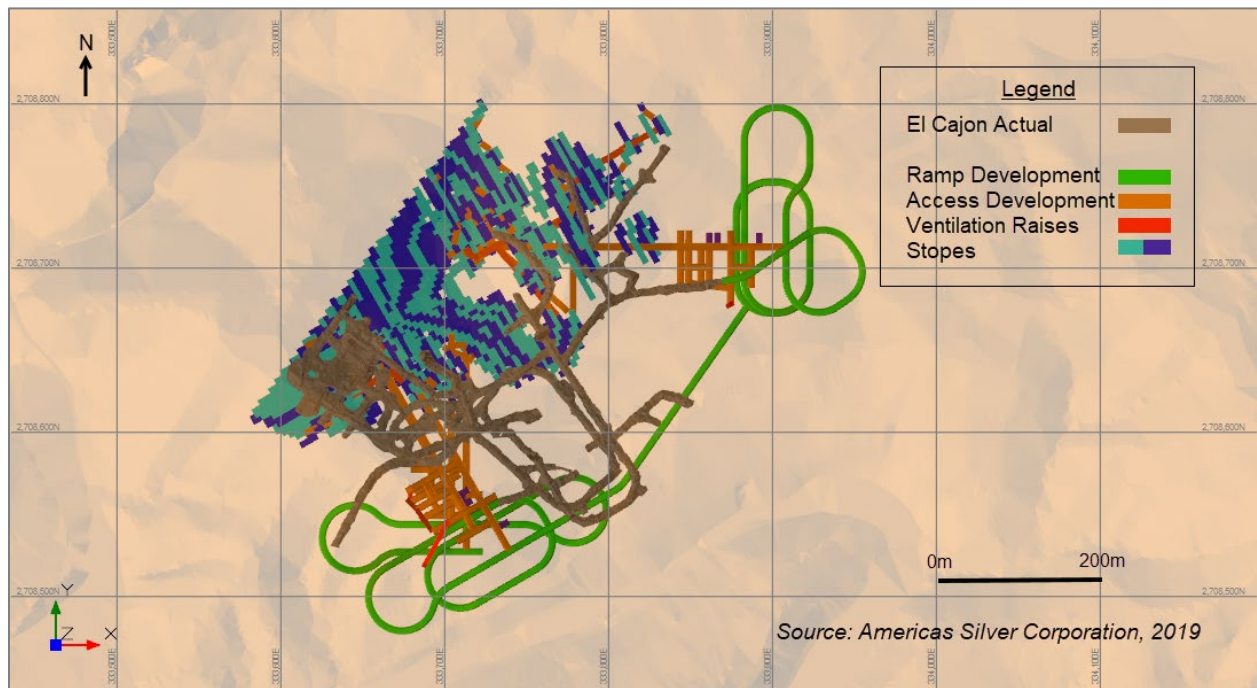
EL CAJÓN MINE DESIGN LAYOUT PLAN VIEW
